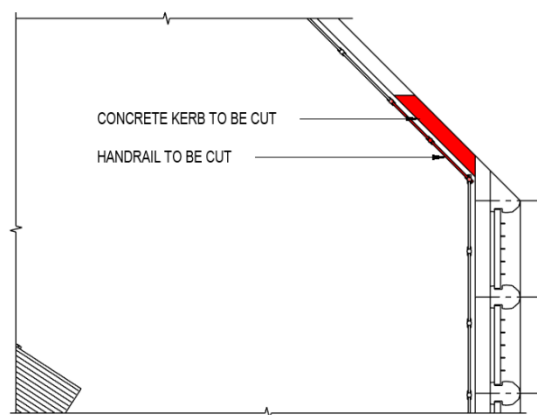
Cutting of the kerb and handrails (refer to drawing 1003061-1000-DRG-CC-0005-T0)
